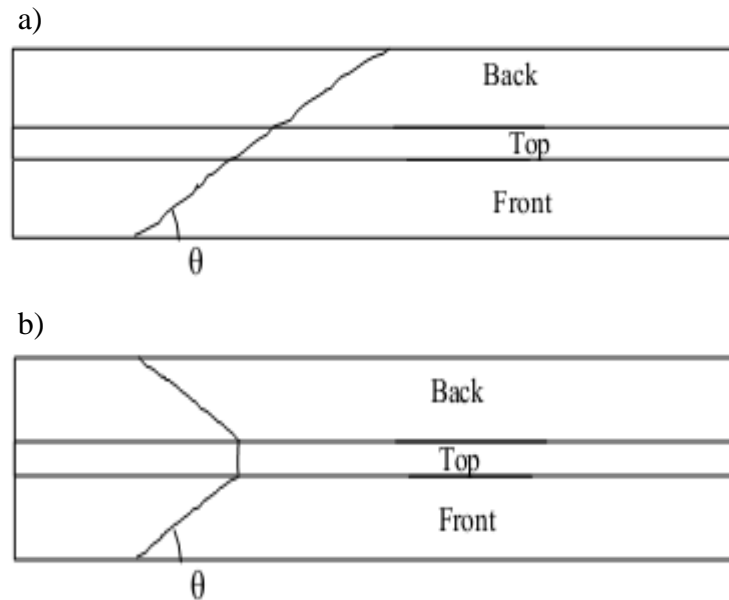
Crack patterns in, (a) beam under shear loading, (b) beam under torsional loading (FIB-14, 2001)
